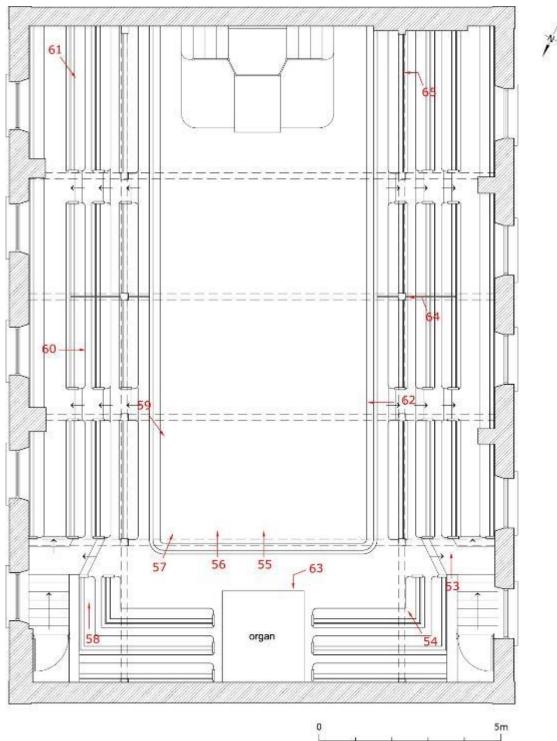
Plan showing location and direction of photographs taken on the second floor (plan supplied by client):
